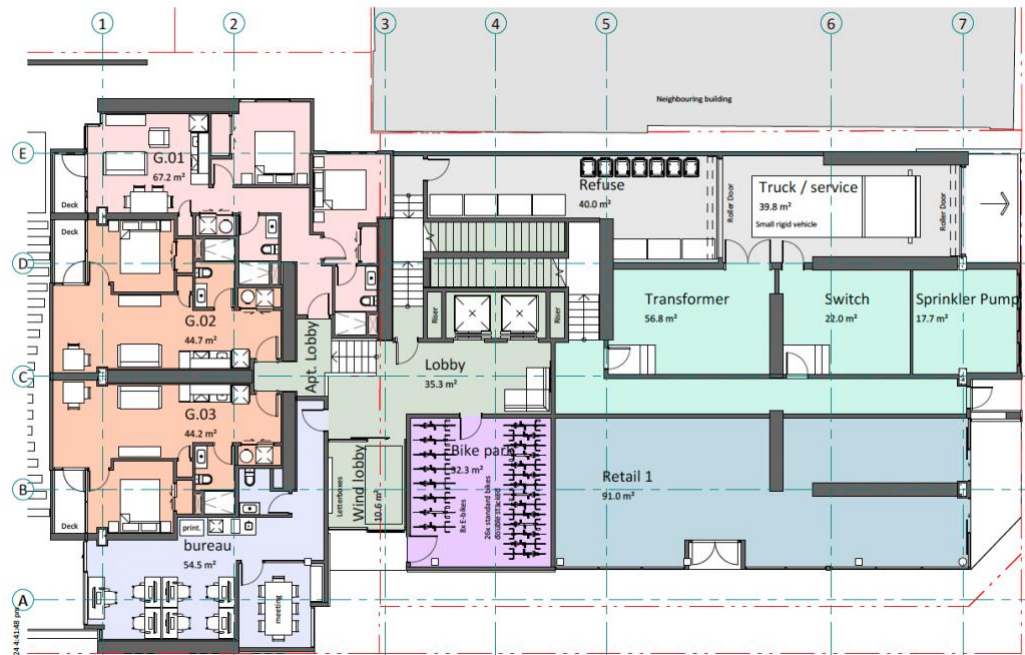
Ground floor plan of a proposed apartment building showing a proposed bike parking area.
